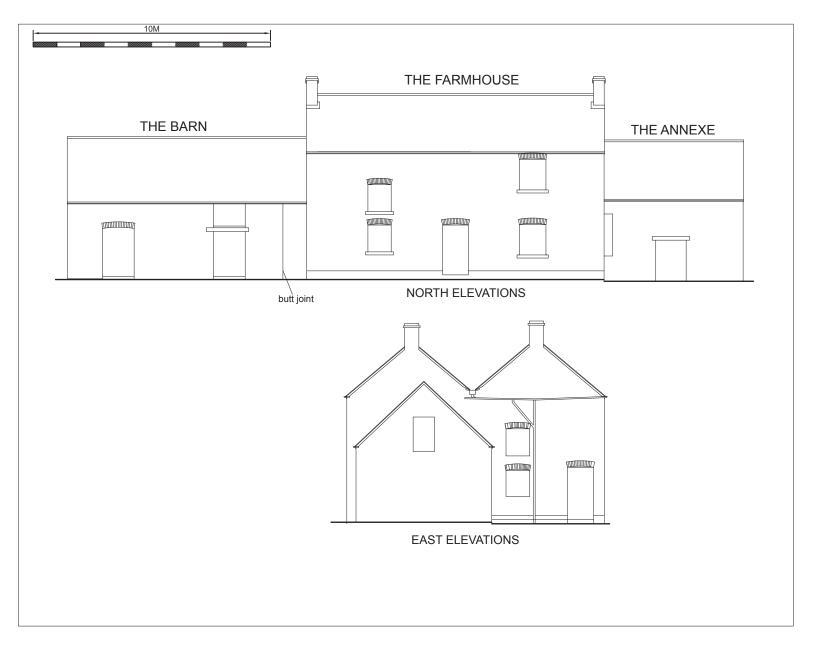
North and East elevations of Dairy Farmhouse and adjoining buildings
